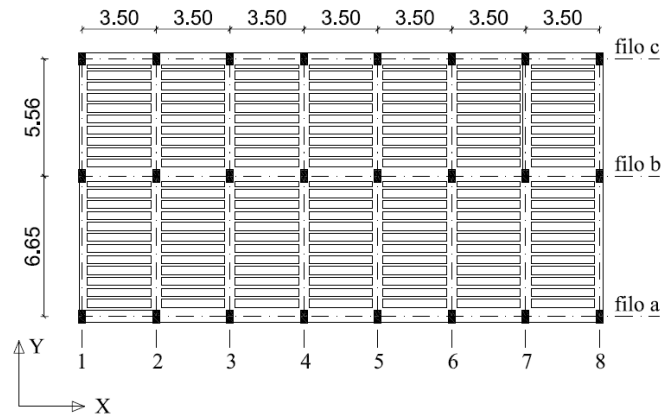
Plan of the analyzed building/ Pianta dell'edificio analizzato.
